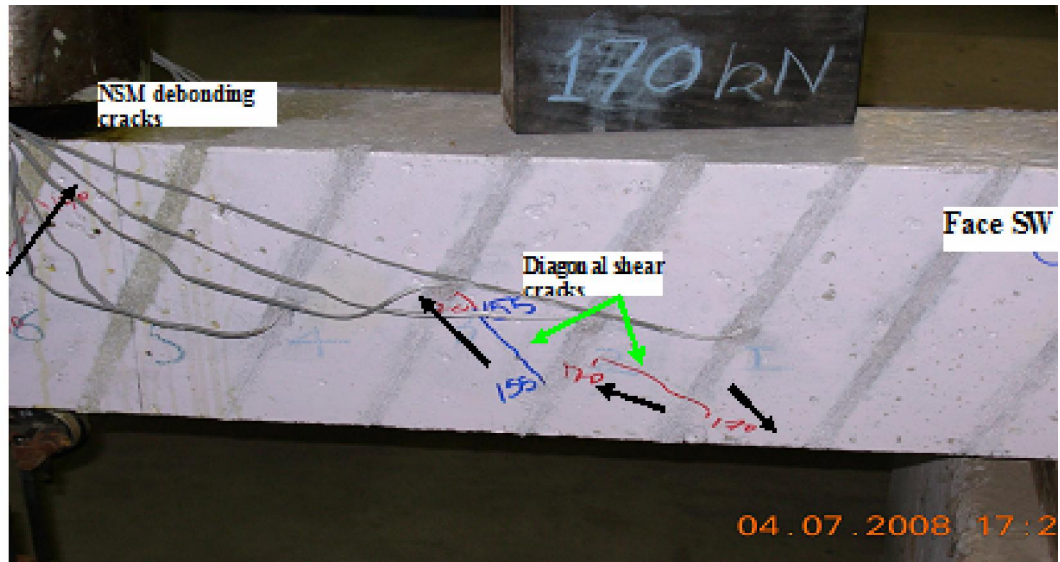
Test B1-SS crack pattern at 170 kN (Face SW)
